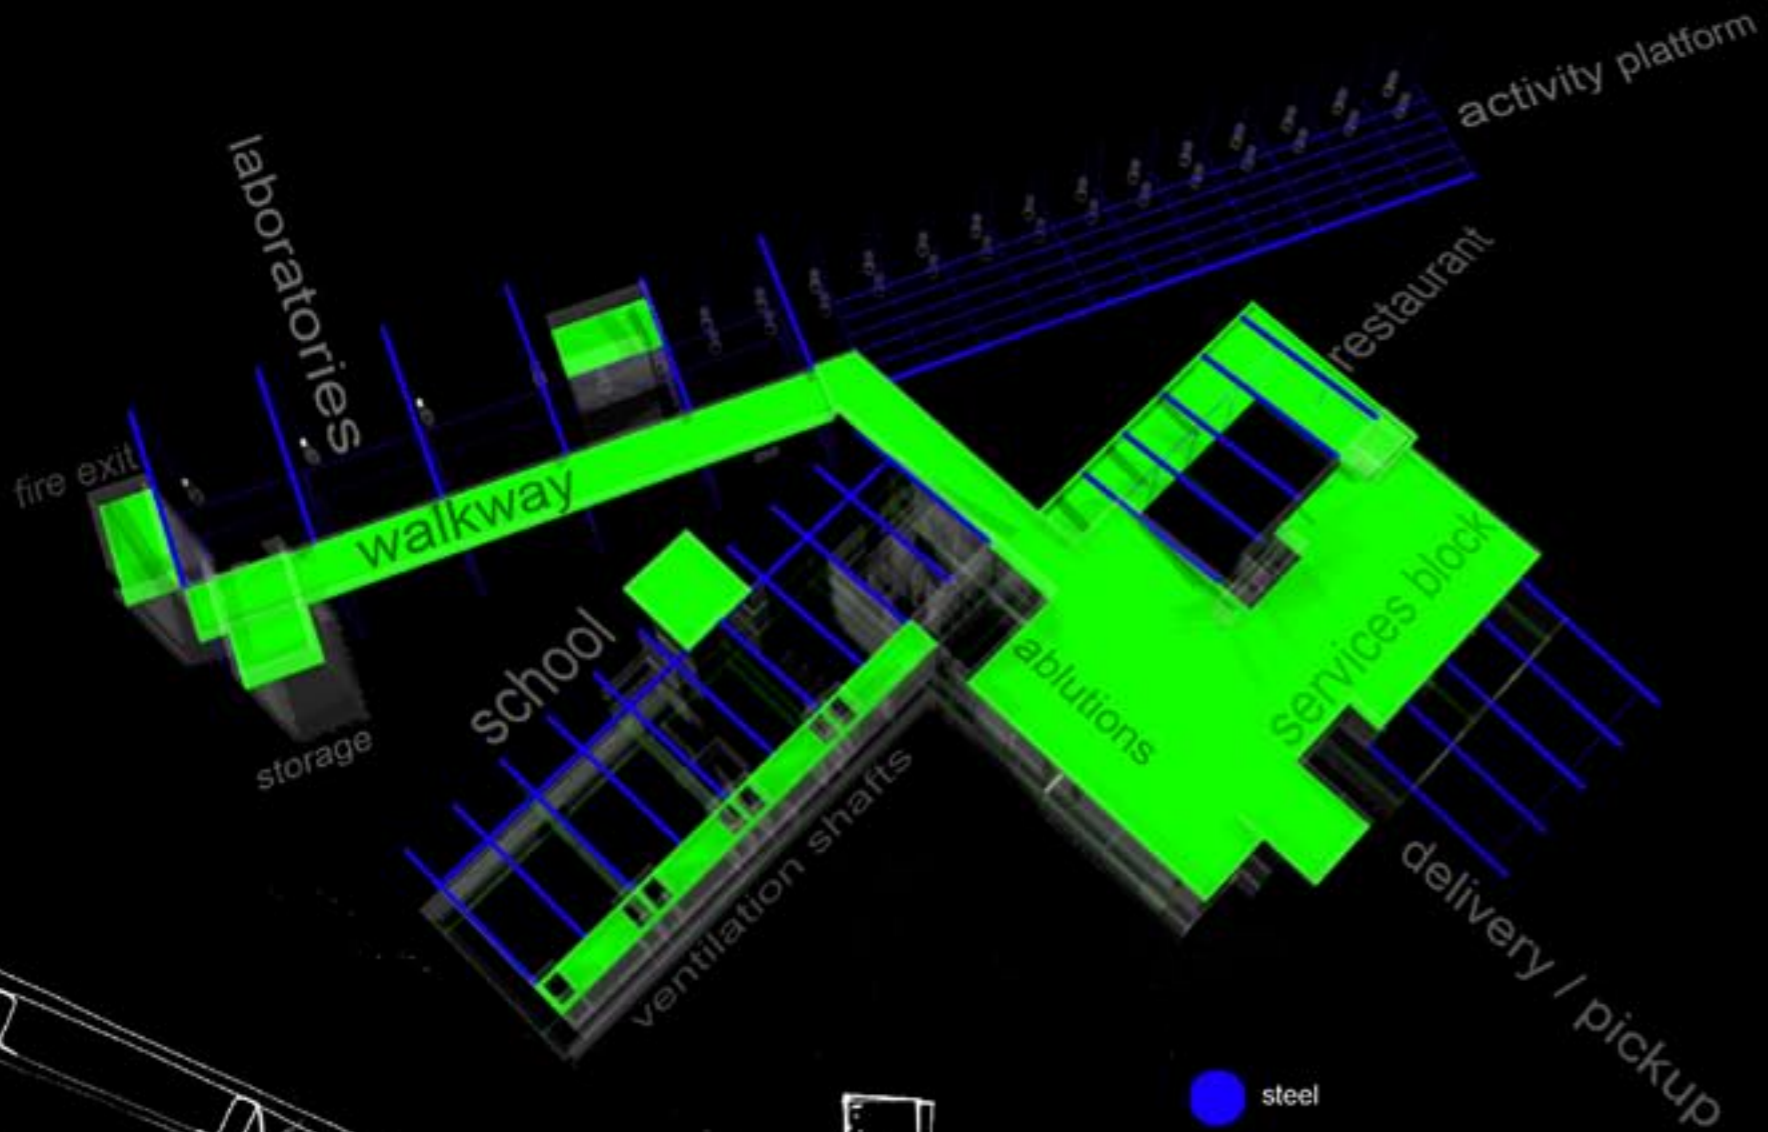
Permanent shutter concrete floor slab used in the brew house.
